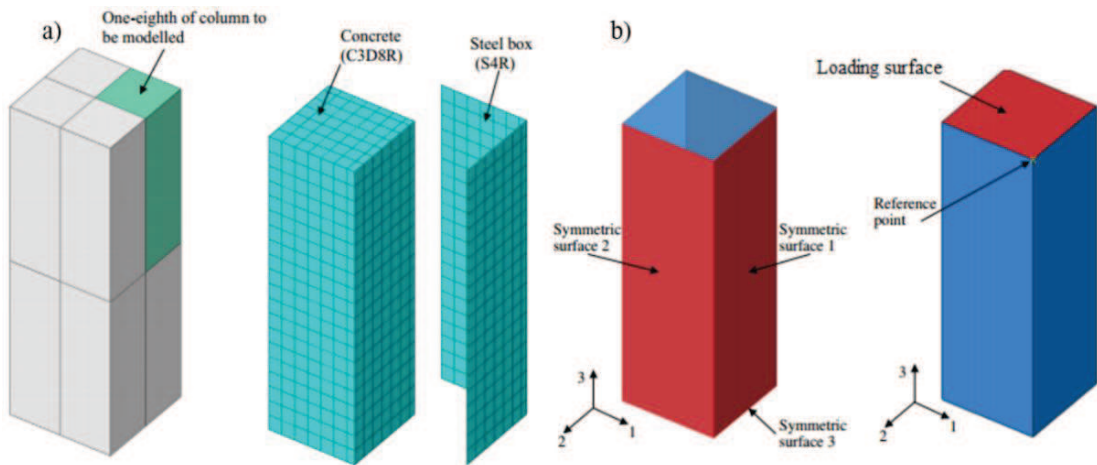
a) Element types and Meshing CFST columns, b) Contact and loading conditions
